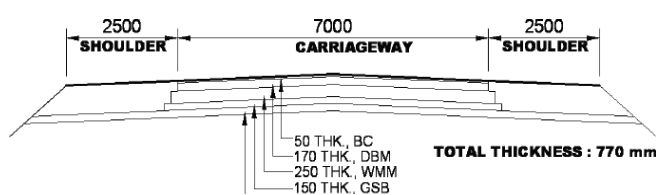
COMPONENT OF FLEXIBLE PAVEMENT AS PER IRC:37-2012
